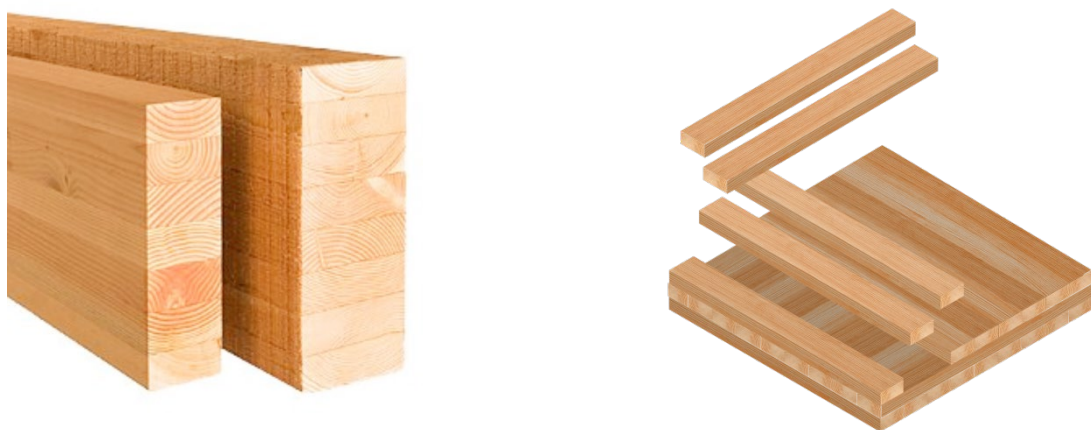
Glued Laminated Timber (Glulam) and Cross-Laminated Timber (CLT)
